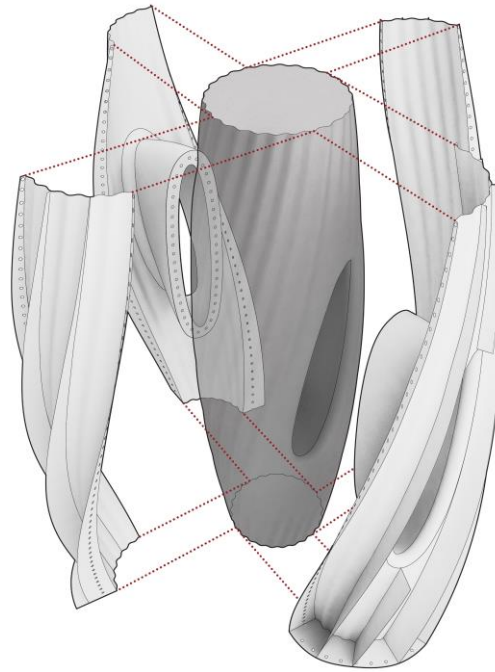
Exploded view of the 3D printed formwork. Source: authors.
